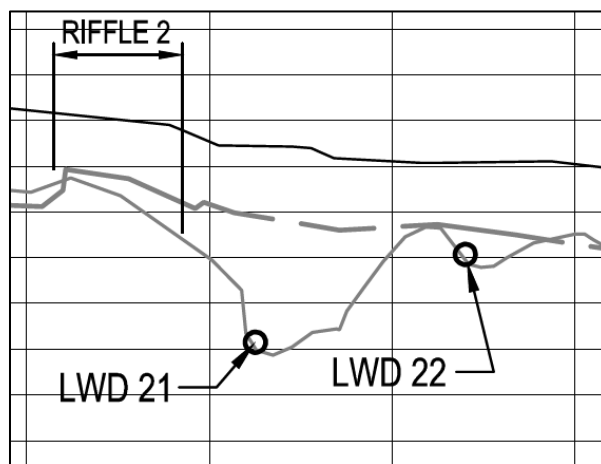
Cross-sectional profile at Cross Section XS16.
